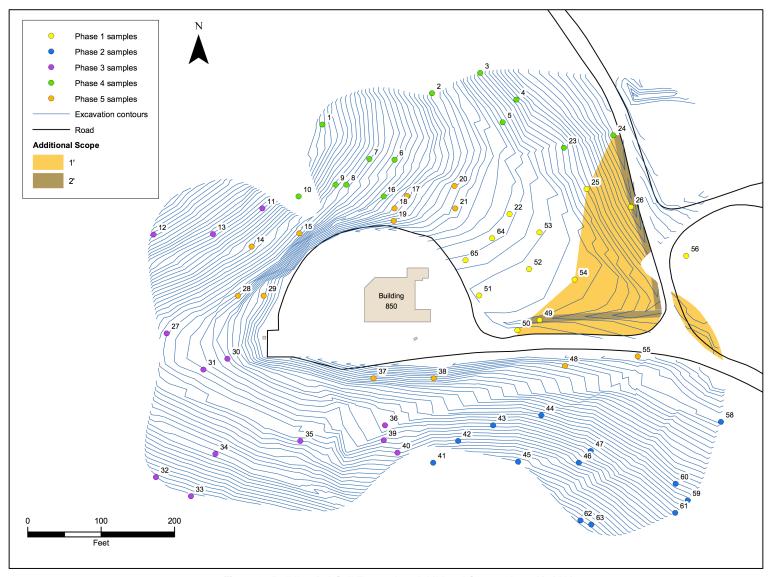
Building 850 Soil Excavation, Additional Scope - June 16, 2009
